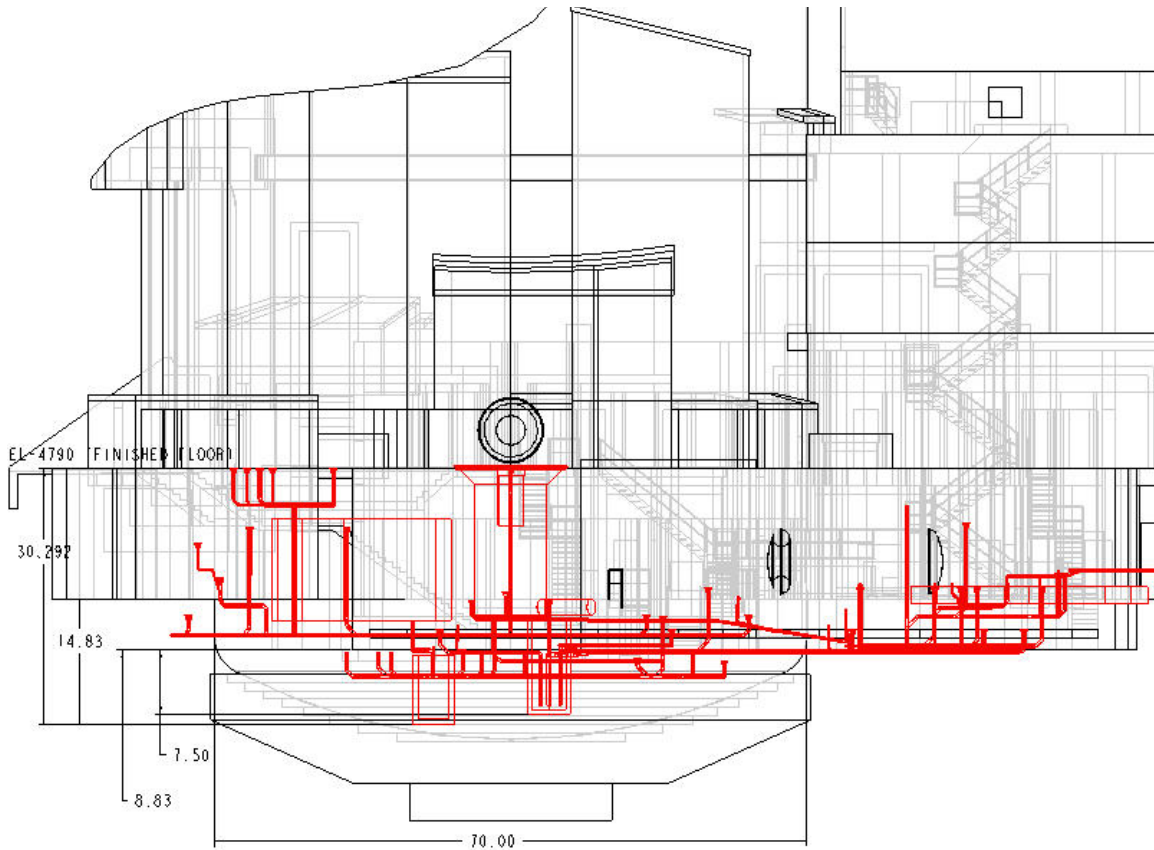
TAN-650 cross-section illustrating sumps and embedded piping.
